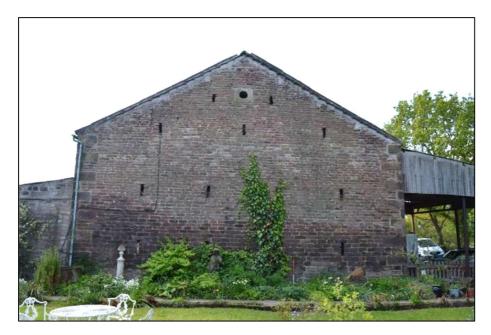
(Shot 29): North elevation of barn (Building 1), showing owl hole, breather slits and eaves (1m scale)
